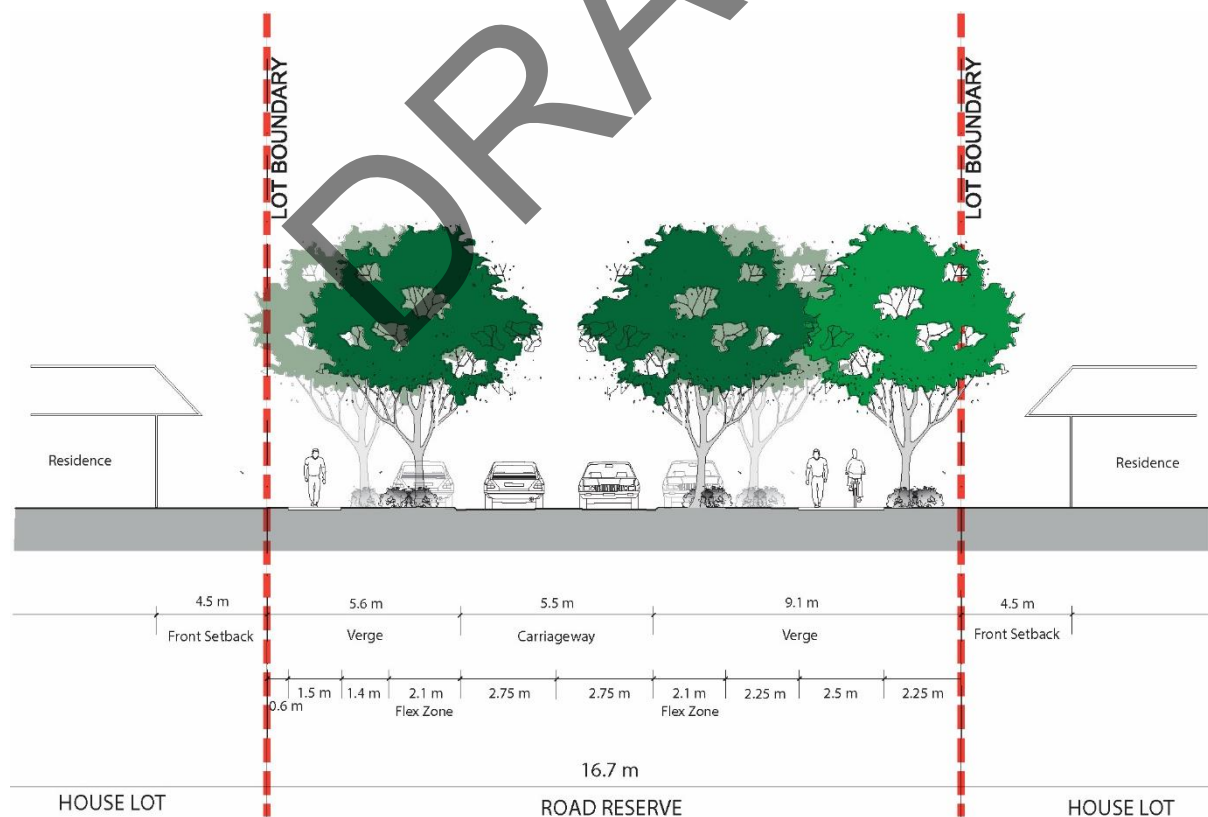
Green Link Road Cross Section (Flex Zone)
